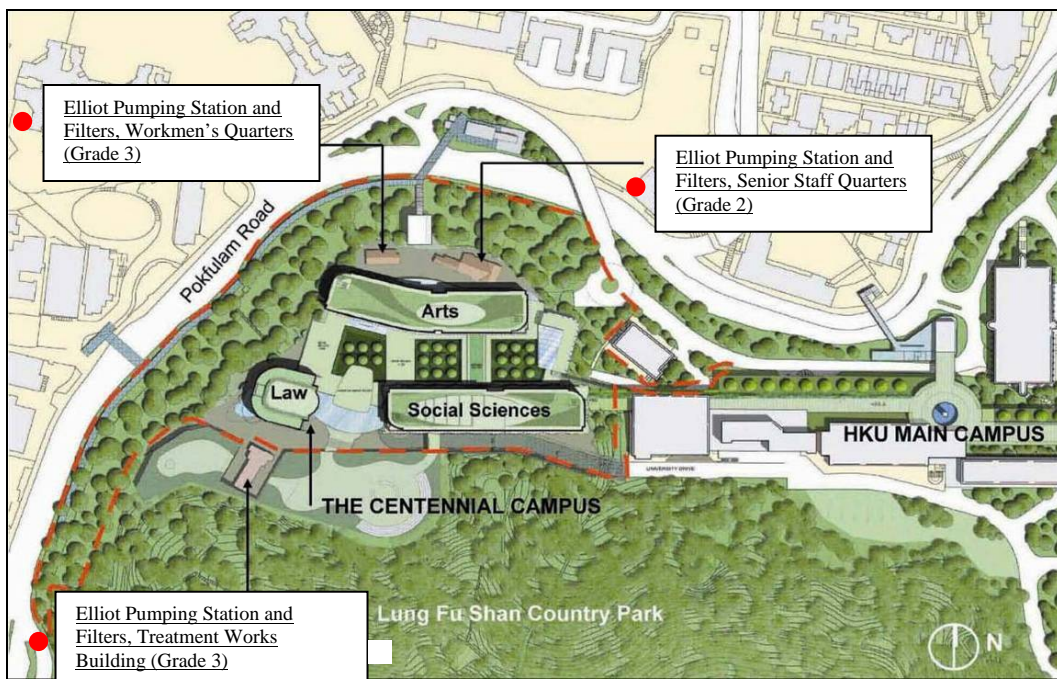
Site plan of the Centennial Campus with the three historic buildings highlighted
